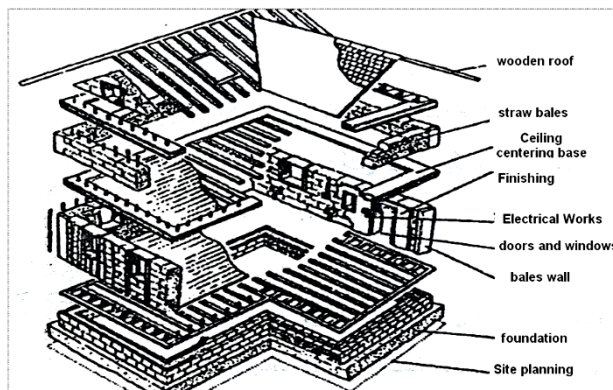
Construction elements for straw bale house from bottom to top (Source: [15]).
